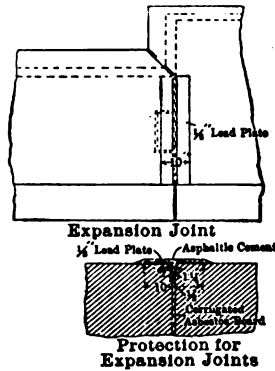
Expansion Joint, Pennypack Creek Bridge.
